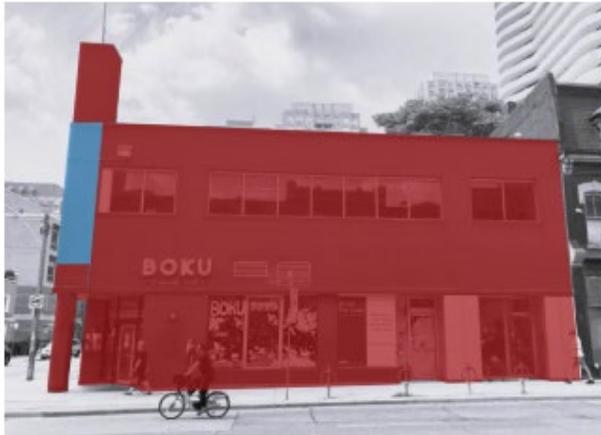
Proposed south elevation of 530 Yonge Street at Breadalbane Street, rendering looking northwest (GPA, September 2025).
